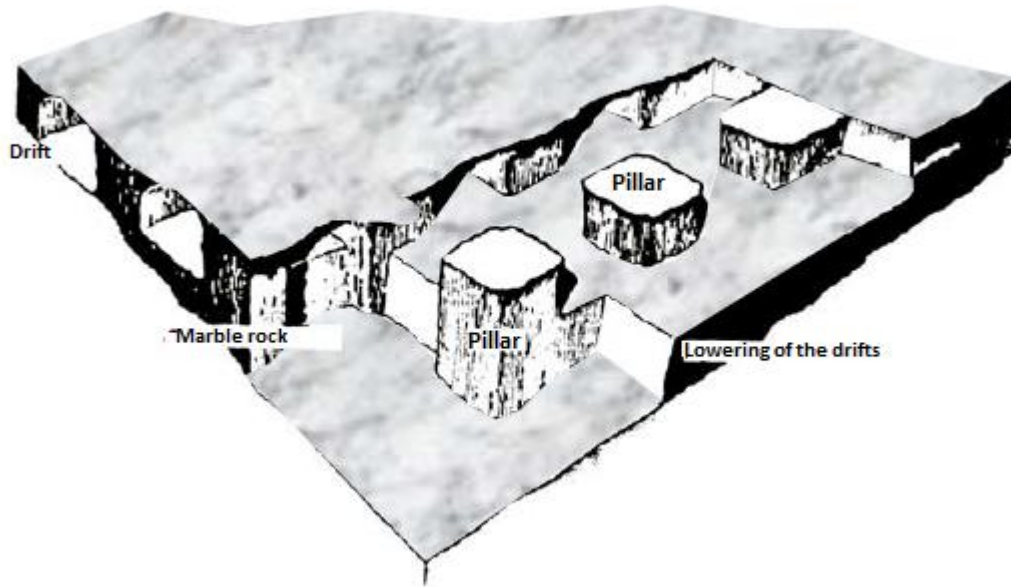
Layout of a room and pillar excavation (adapted from Palma Guerreiro, 2000).
